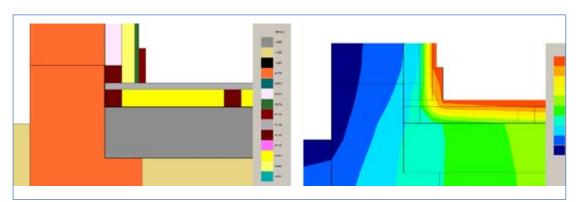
A junction between a wall and a ground floor showing a solid brick (or no-fines) wall supporting a concrete slab, with timbers laid along the length of the floor and insulation placed between the floor timbers. Above the floor timbers is a timber-based floor covering and above this is a plasterboard-insulation laminate with a 30mm air gap behind the laminate. N.B. Although not shown, a damp proof membrane should be provided between the new floor structure and the existing floor, and it should also be lapped up the external wall to protect the edge of the new floor structure.
